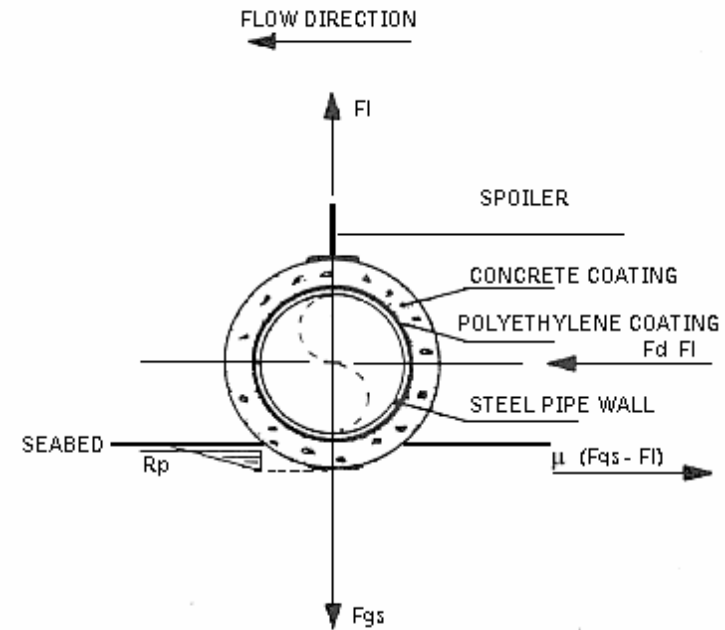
Forces acting on the spoiler pipe embedded into soil
